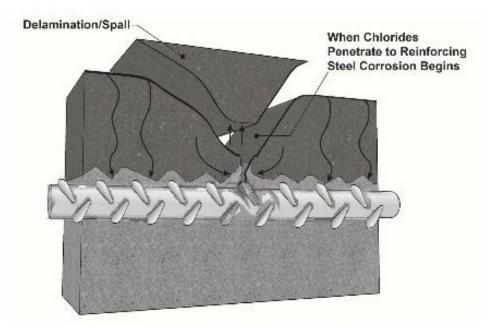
Spalling of reinforcing steel due to applications of chlorides from deicing salt
